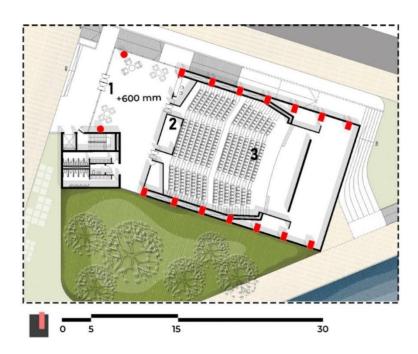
Blowup 2 of Ground Floor Plan. Source: Author
